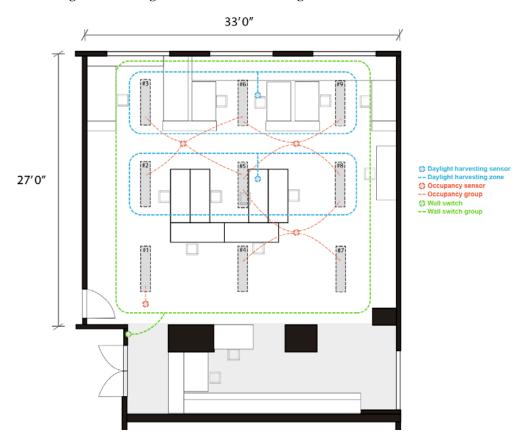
Redesign Solution Fixture Zoning and Control Sensor Placement
